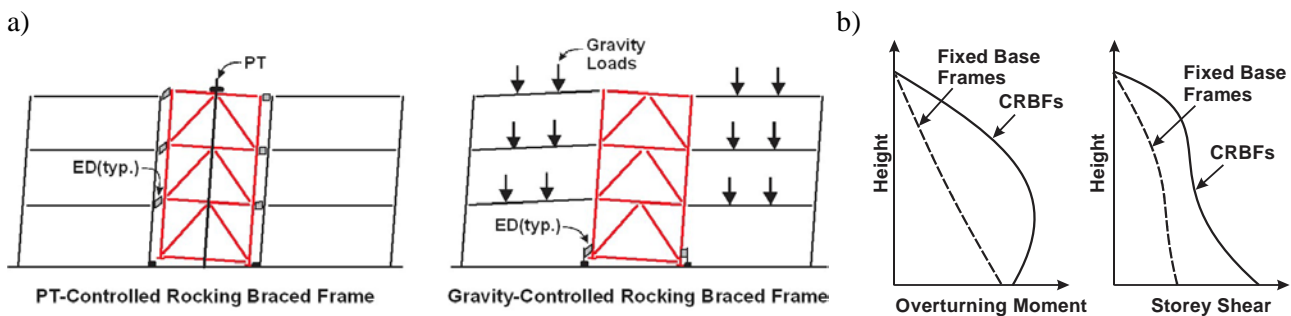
a) Rocking steel braced frames; b) Force demand in fixed base and rocking steel braced frames.
